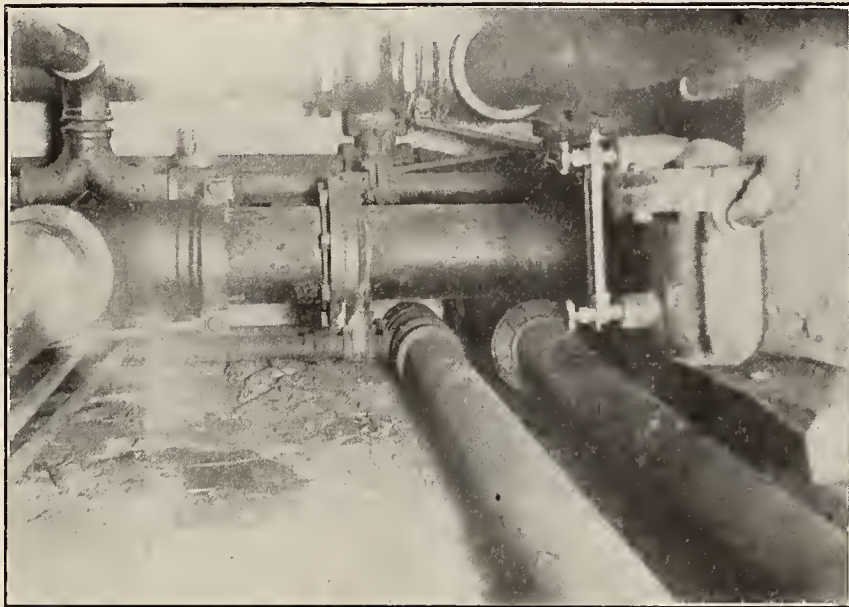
VIEW OF PIPING IN TUNNELS, ELKHART ROUNDHOUSE.
